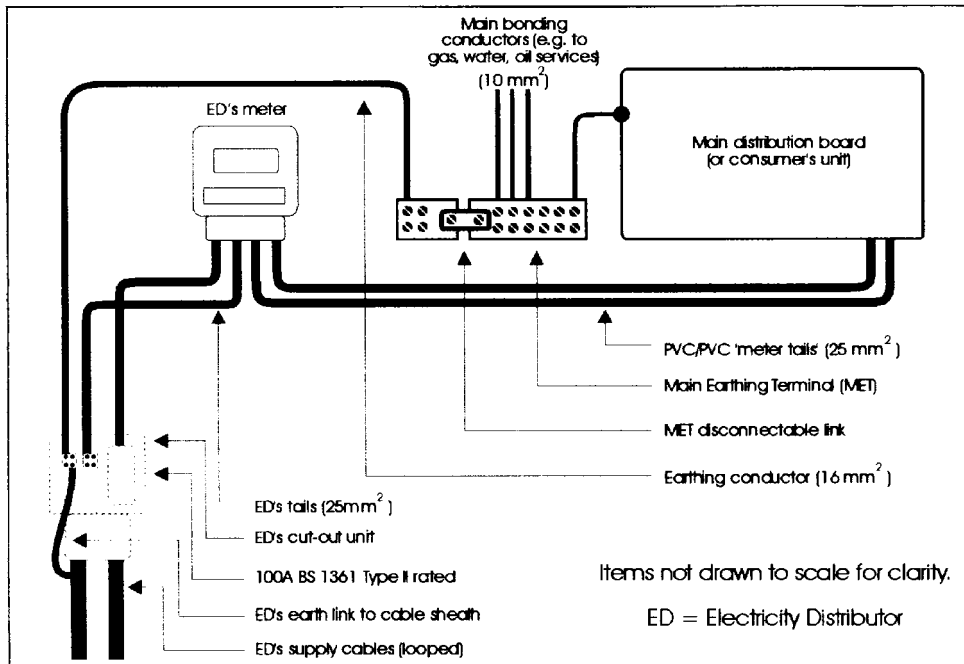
Typical arrangement for connection of a smaller installation on a TN-S system
